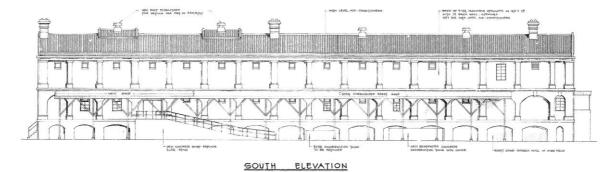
Proposed renovation on south façade, extracted from Architectural Proposed Plan for Kowloon Park, Drawing No. ASM/ 5704, dated 1986. (Source: Architectural Services Department)
